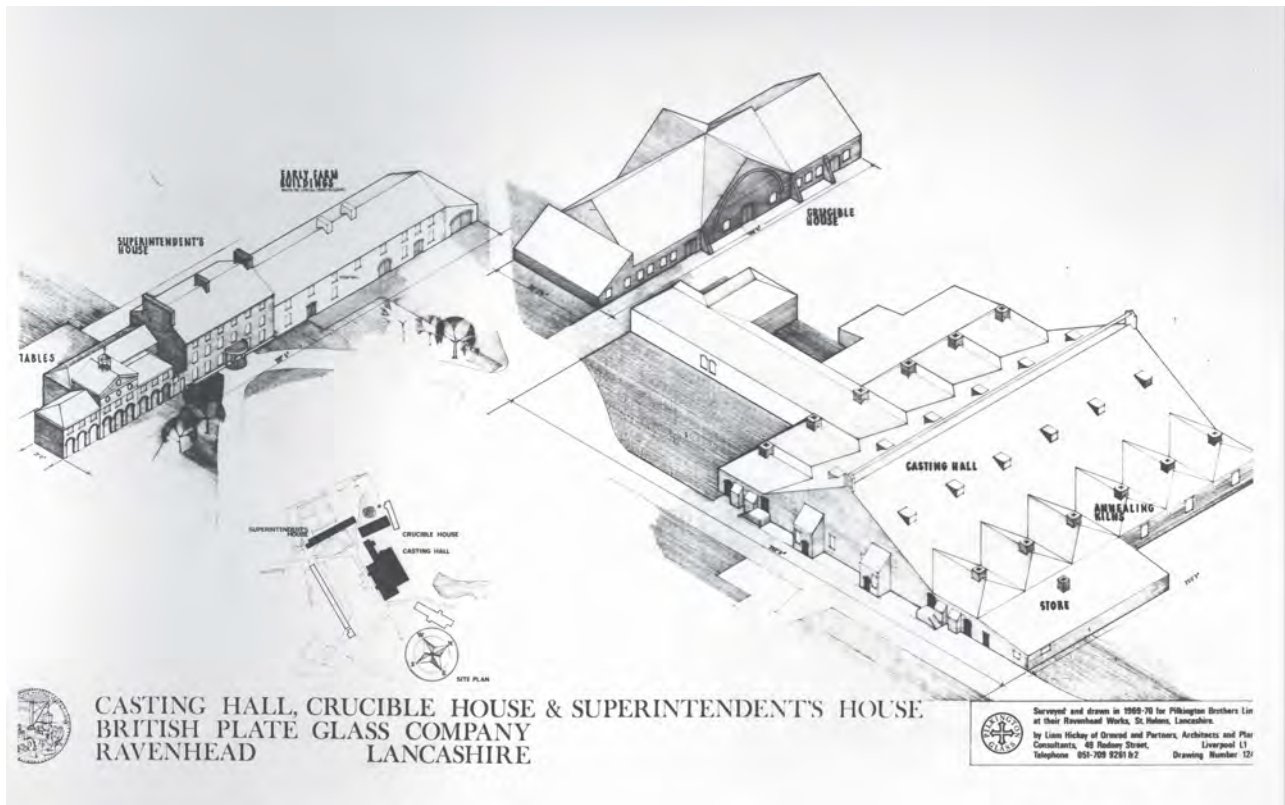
Architectural drawing of the British Cast Plate Glass Manufacturers' Works at Ravenhead, Merseyside, c. 1790, with the casting hall, crucible house and superintendent's house
